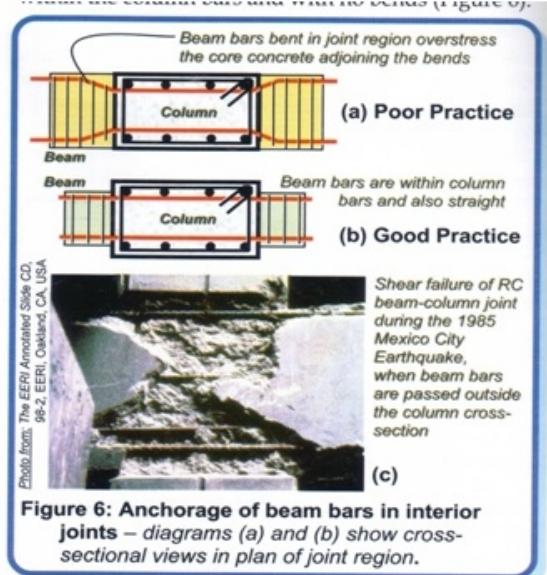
Anchorage of beam bars in interior joints – diagrams (a) and (b) show cross-sectional views in plan of joint region.
